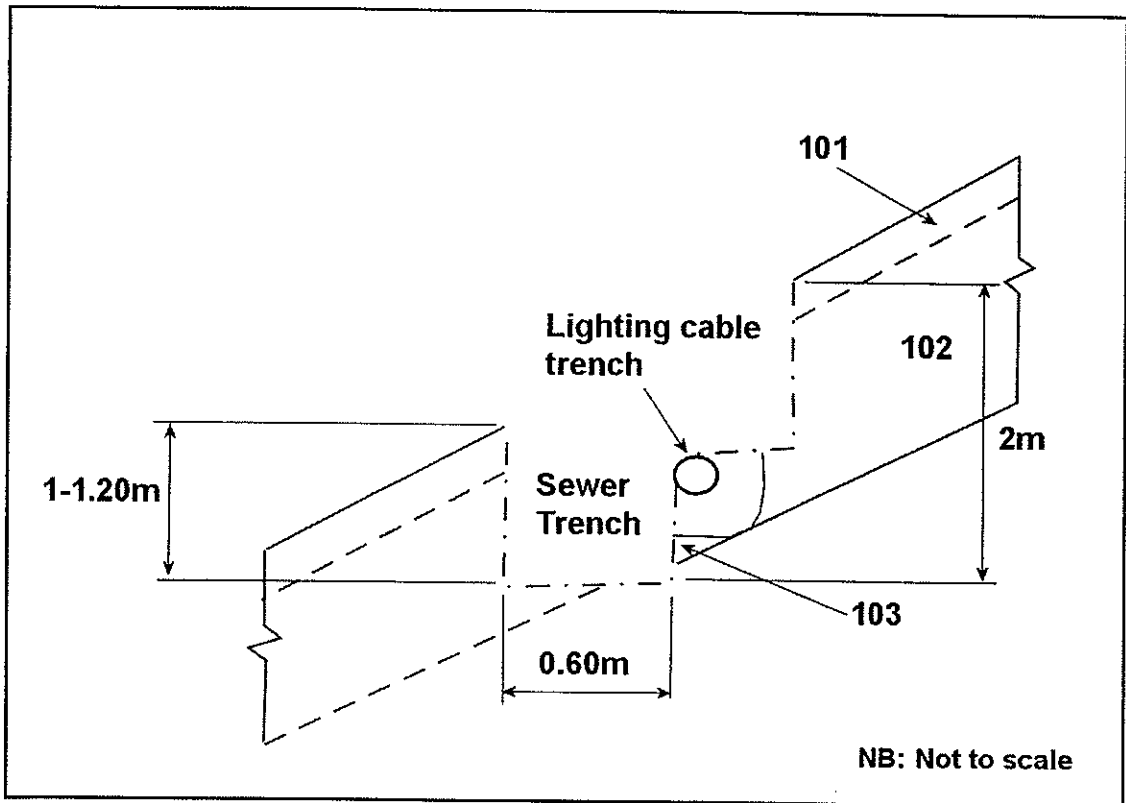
Transverse sketch section of sewer trench in environs of MH S53 – looking north
